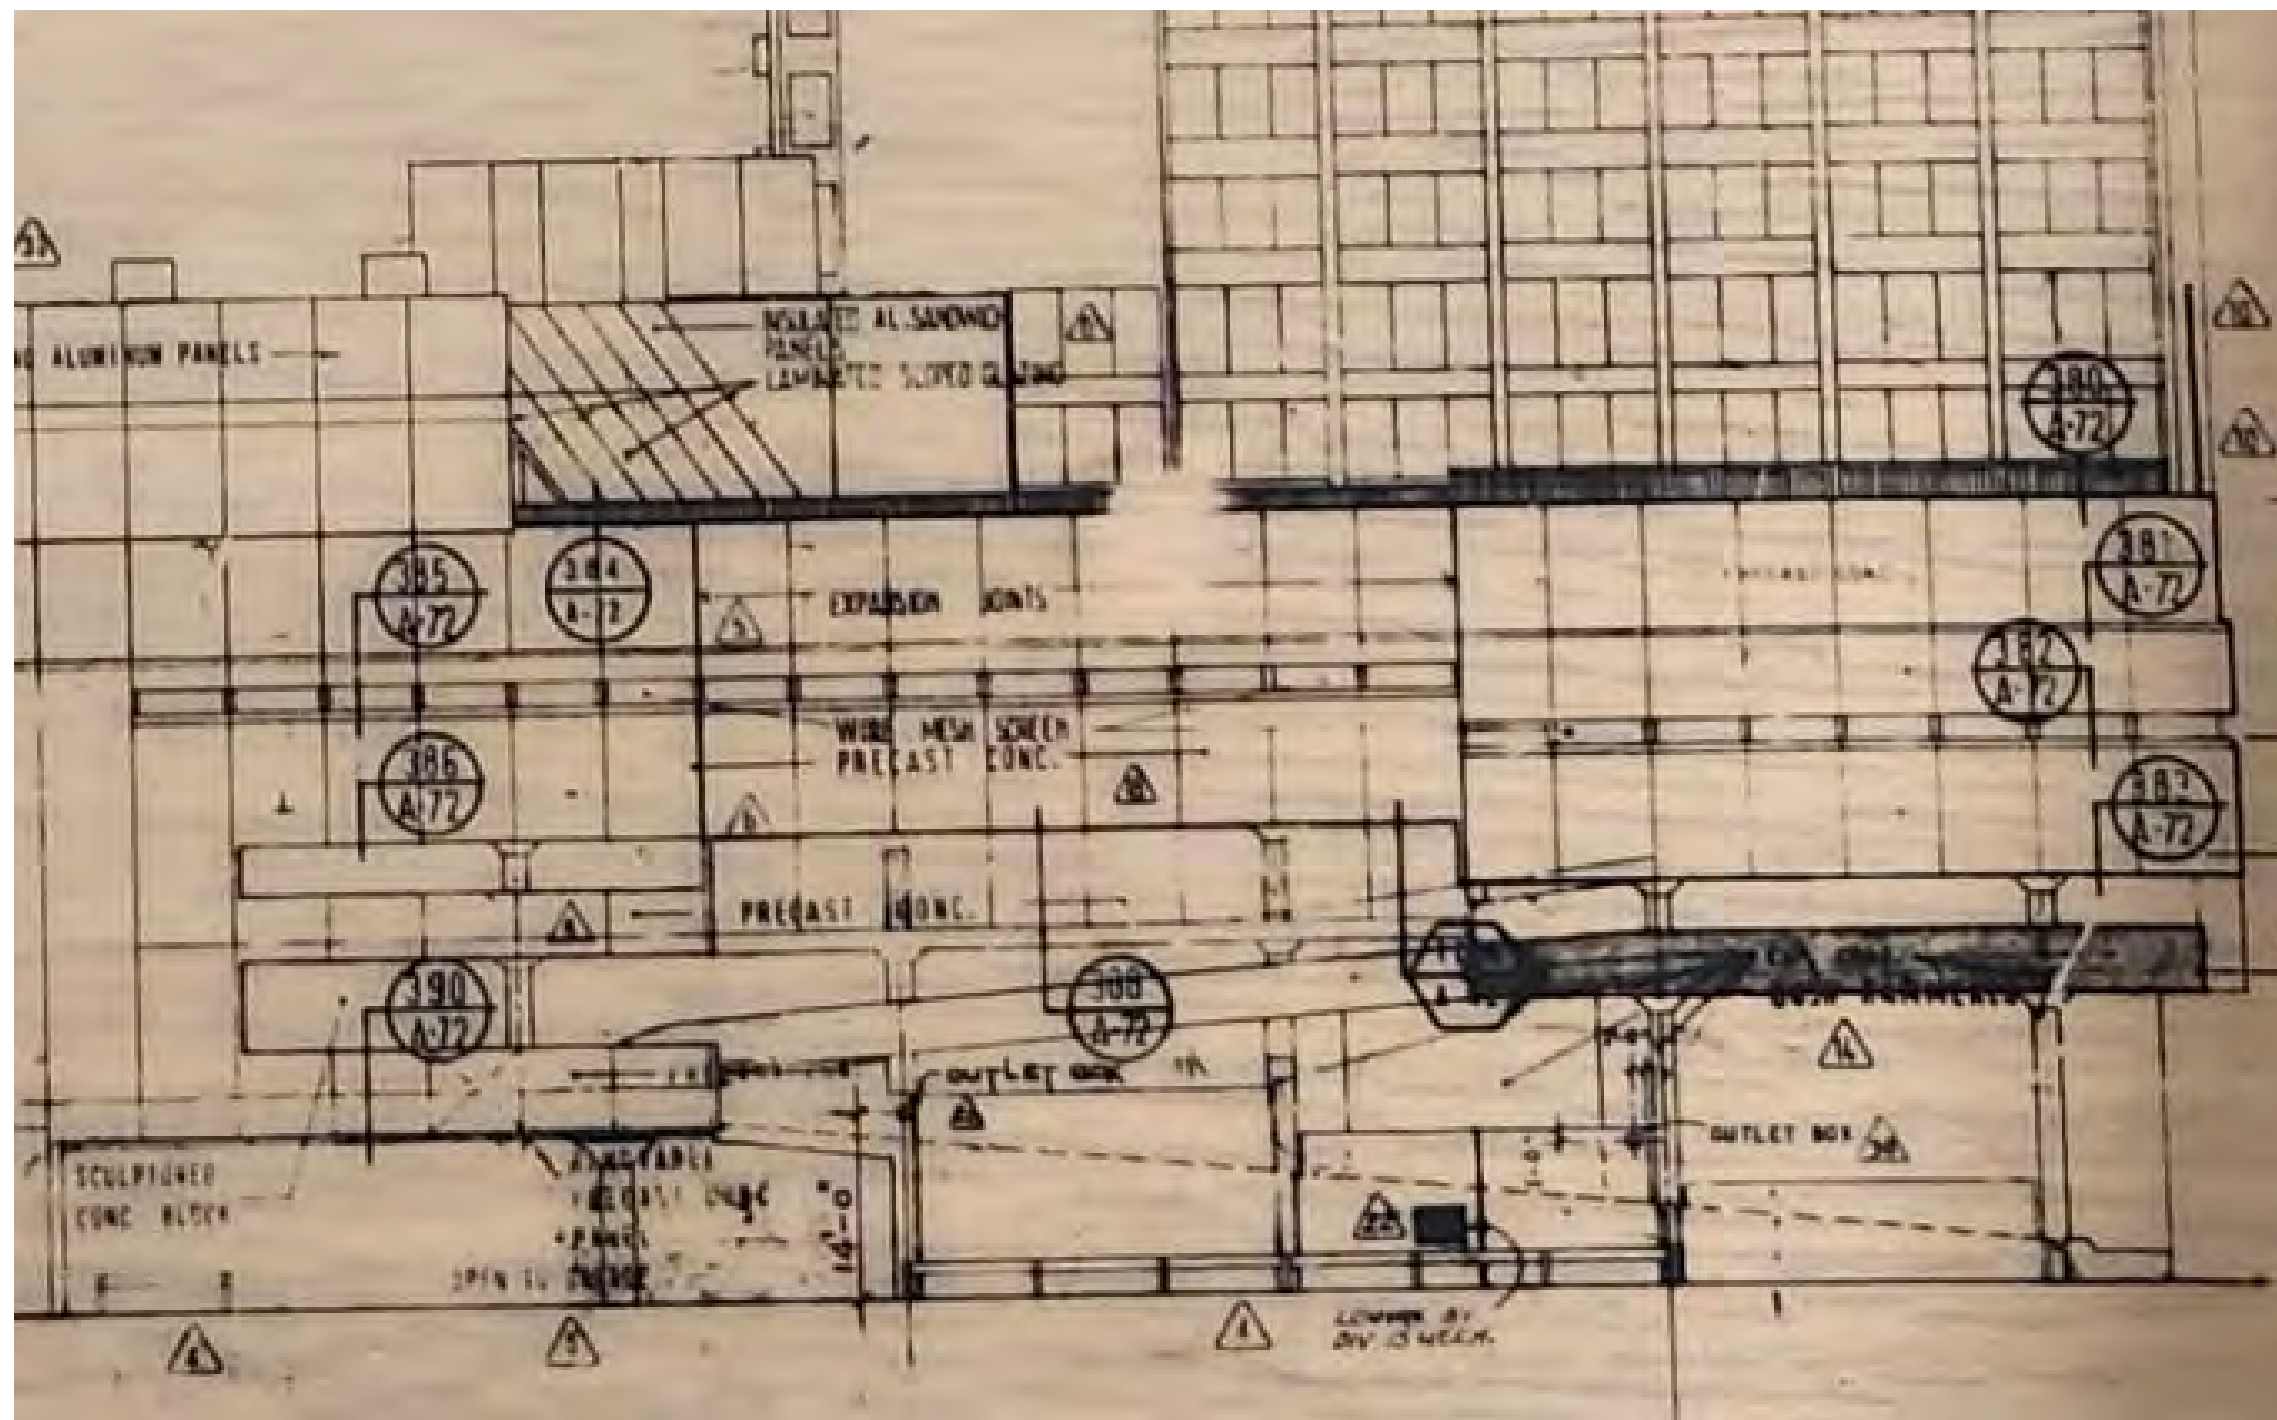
Detail of drawing showing east elevation of the podium, north half 1973 (Campeau Corporation).
